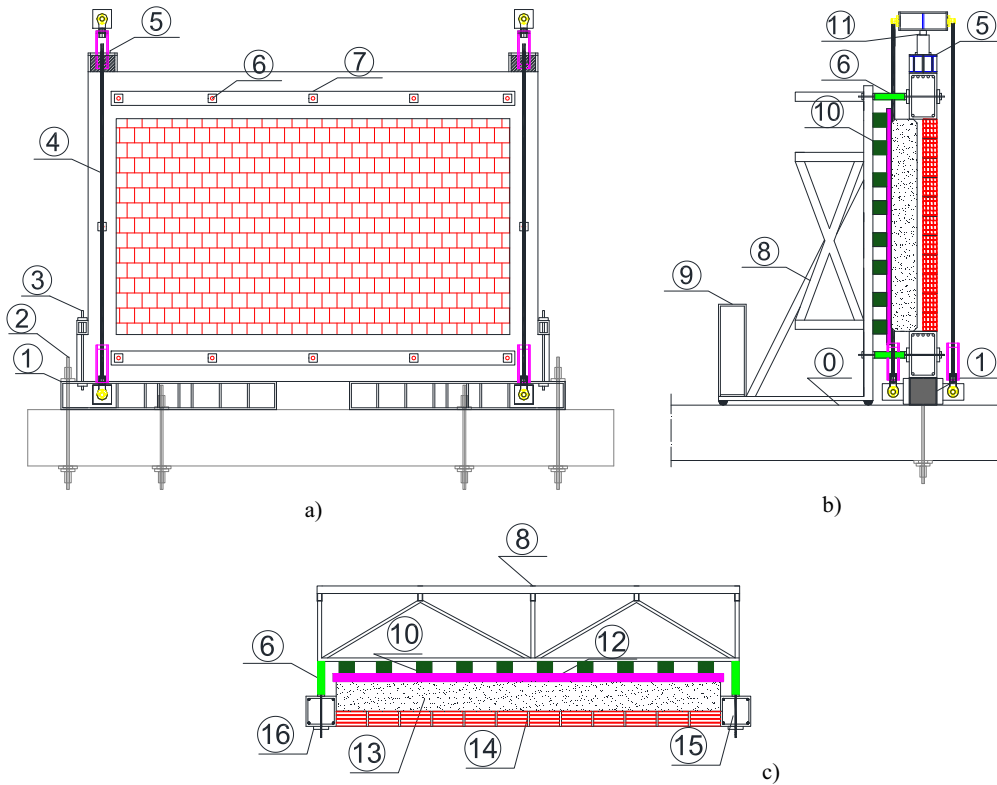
Layout of the out-of-plane test setup, a) front, b) lateral and c) plan view: 0 - strong floor, 1 - foundation steel shape, 2 - high-strength rods ($\phi 30\text{mm}$) fixing the foundation steel shape to the reaction slab, 3 - steel rod ($\phi 20\text{mm}$) connecting the RC frame to the foundation steel shape, 4 - vertical high-strength rods ($\phi 30\text{mm}$) to apply axial load, 5 - steel cap, 6 - steel rods ($\phi 20\text{mm}$) connecting the RC frame and the reaction structure, 7 - distributing load plate, 8 - self-equilibrated reaction steel structure, 9 - counterweight, 10 - wood bars, 11 - hydraulic jack (for axial load application), 12 - vertical wooden platform, 13 - airbags, 14 - infill panel, 15 - RC column, 16 - steel plate for rod force distribution.
